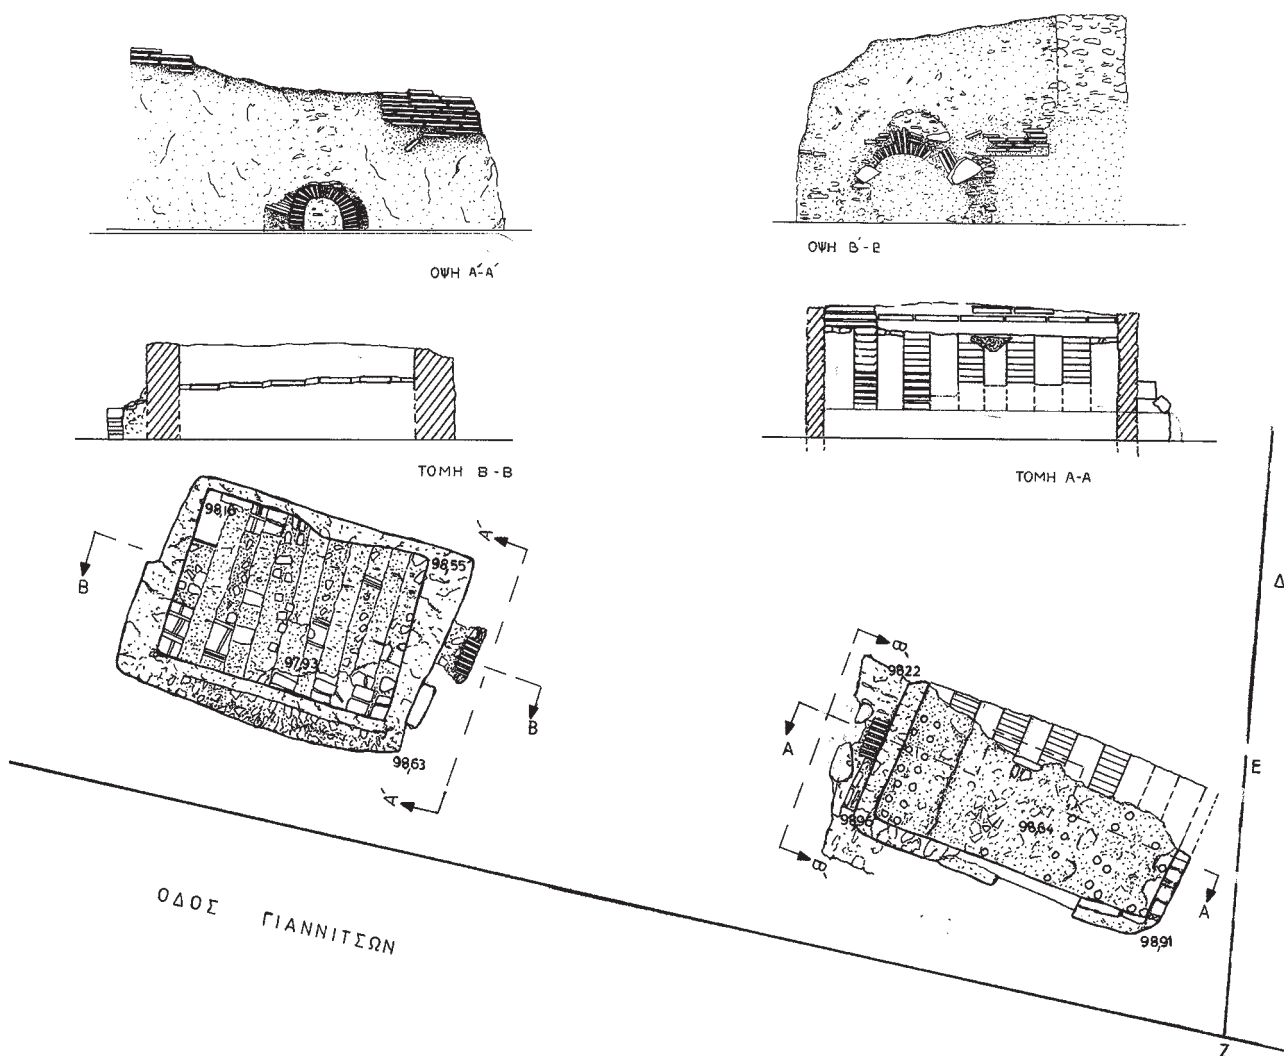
48 Giannitsōn Street, plan, sections and views of the kilns.
